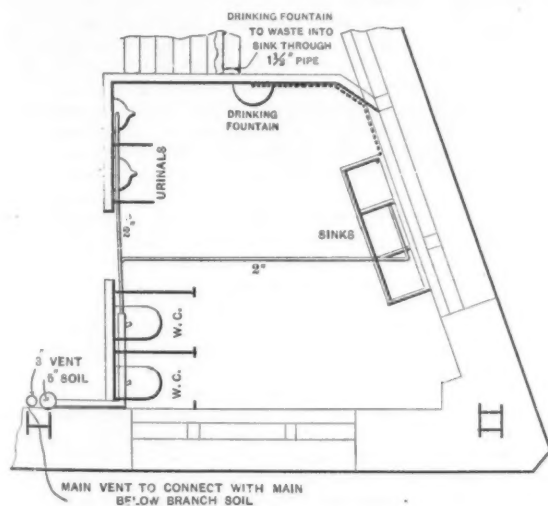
Plan of Toilet Rooms in Boiler Department.
